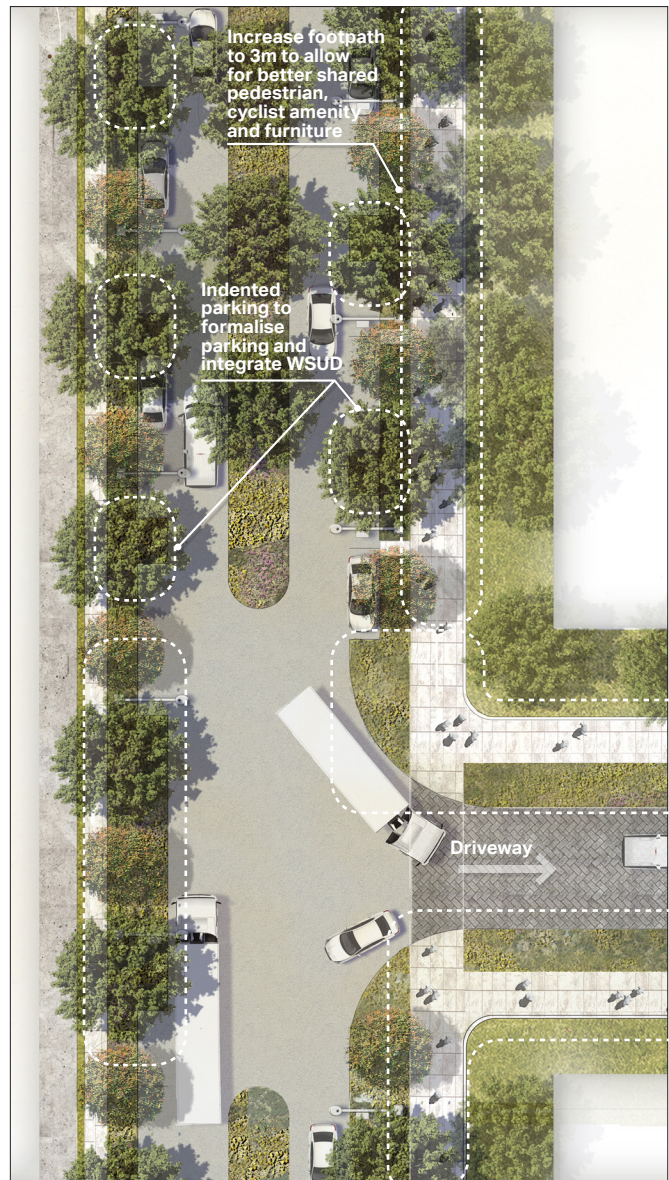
Streetscape Canopy Long Term Concept Plan (Source: AECOM, 2018)
